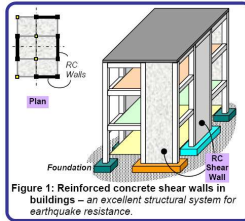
Reinforced concrete shear walls in buildings – an excellent structural system for earthquake resistance.
